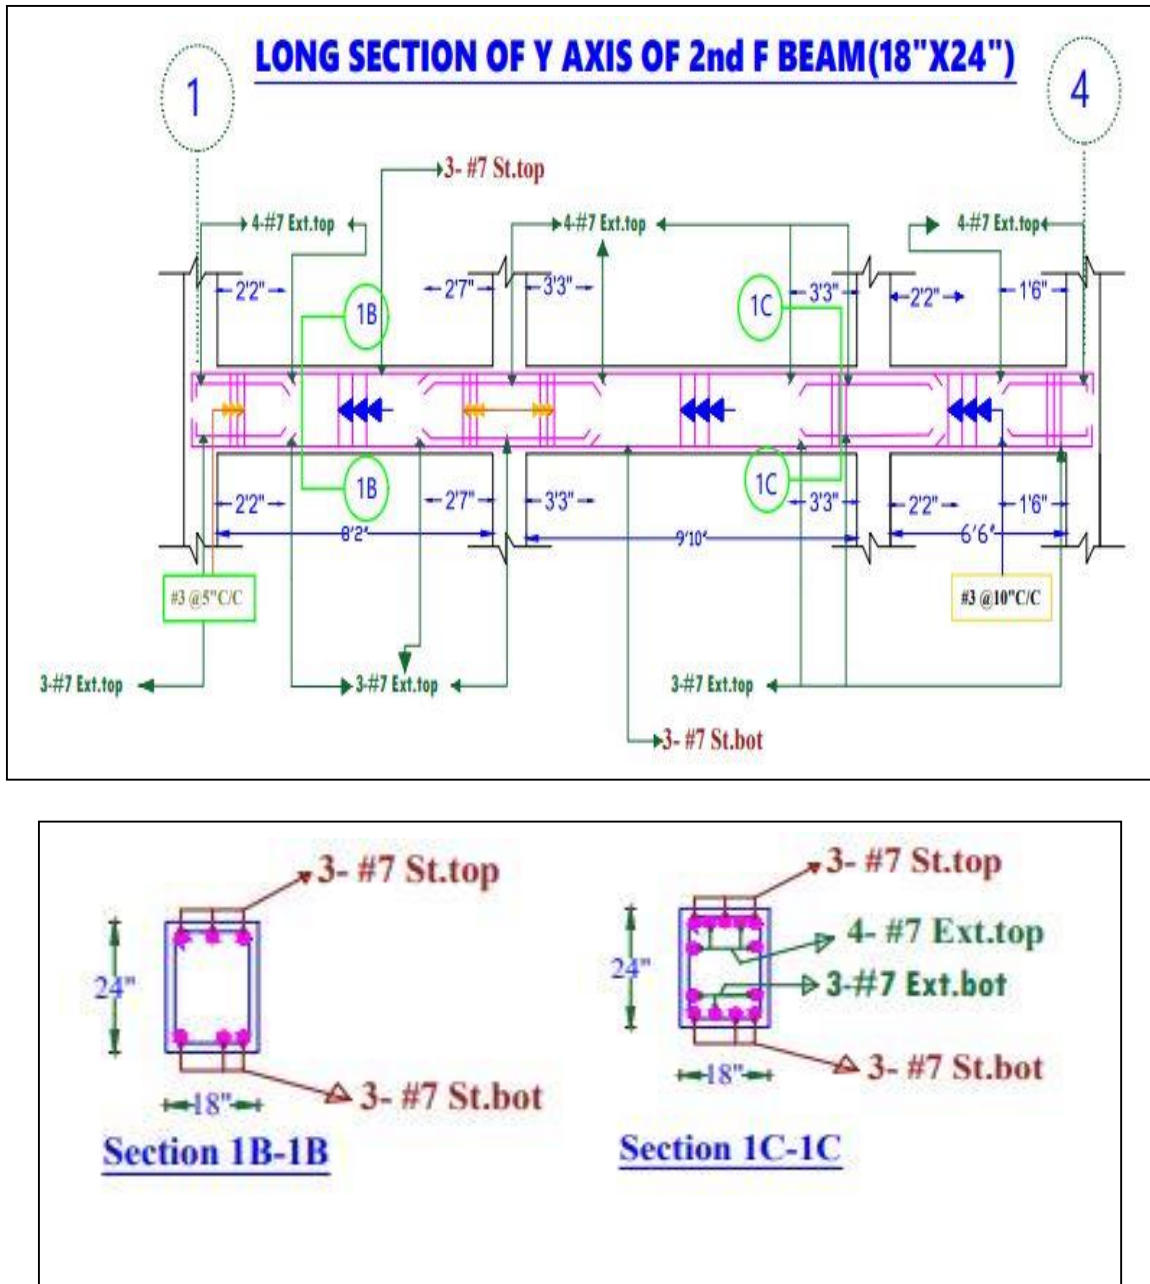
Beam Detailing & Cross Section of Y-axis
